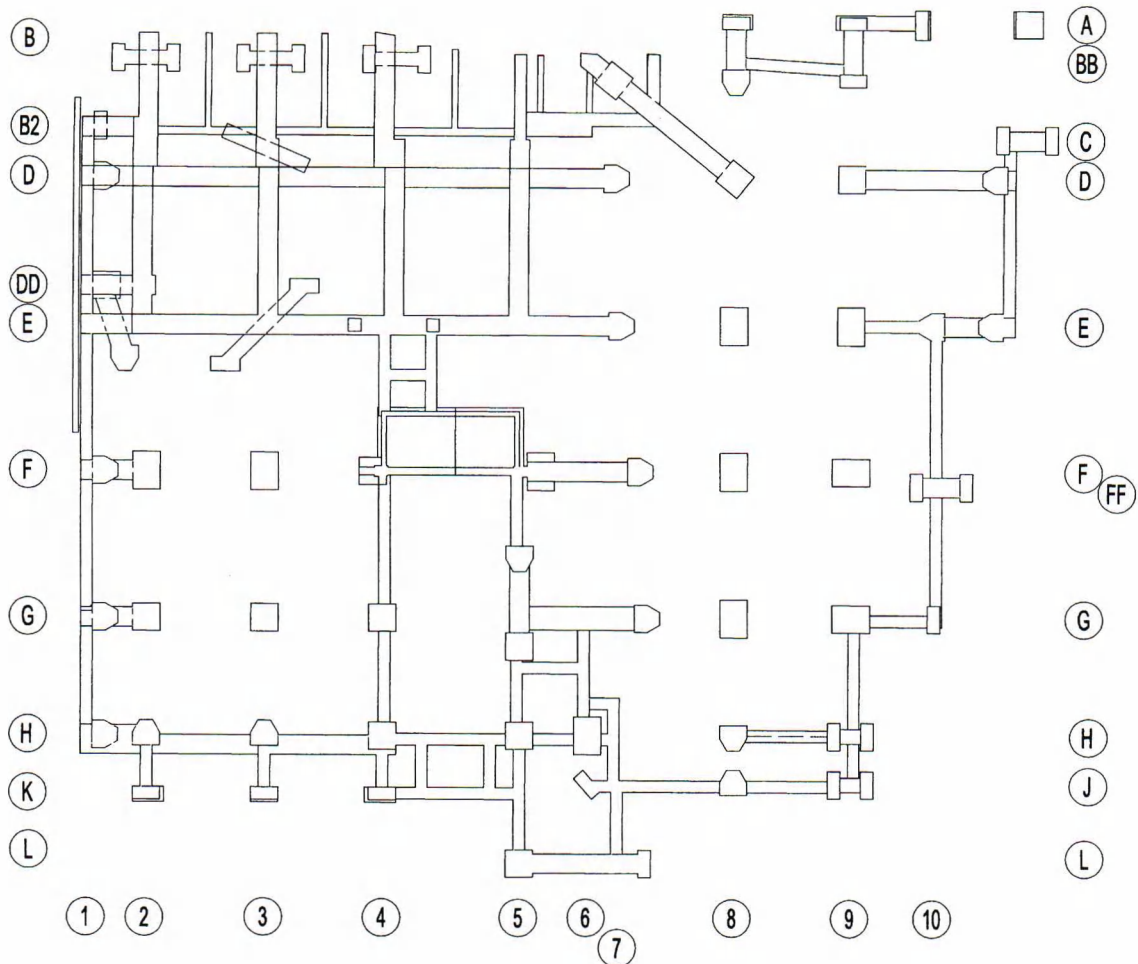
Plan showing the pile and ground beam locations (letters and numbers refer to piling grid).
